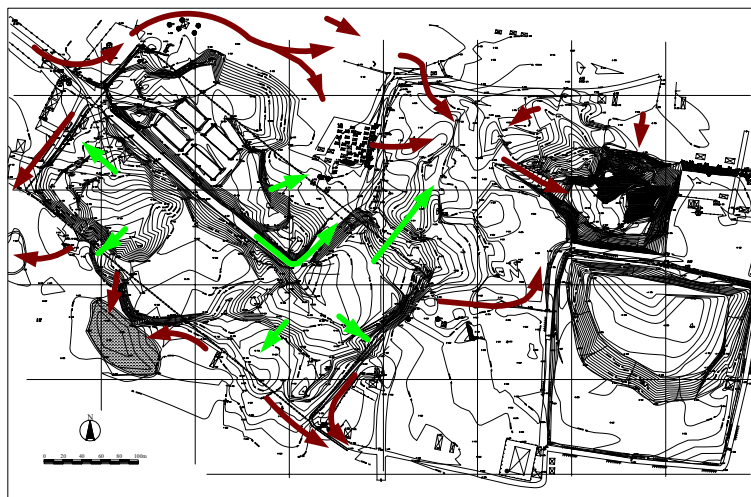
Rainwater and Leachate Drainage System of SMCDS Before the Construction of Expansion Area
